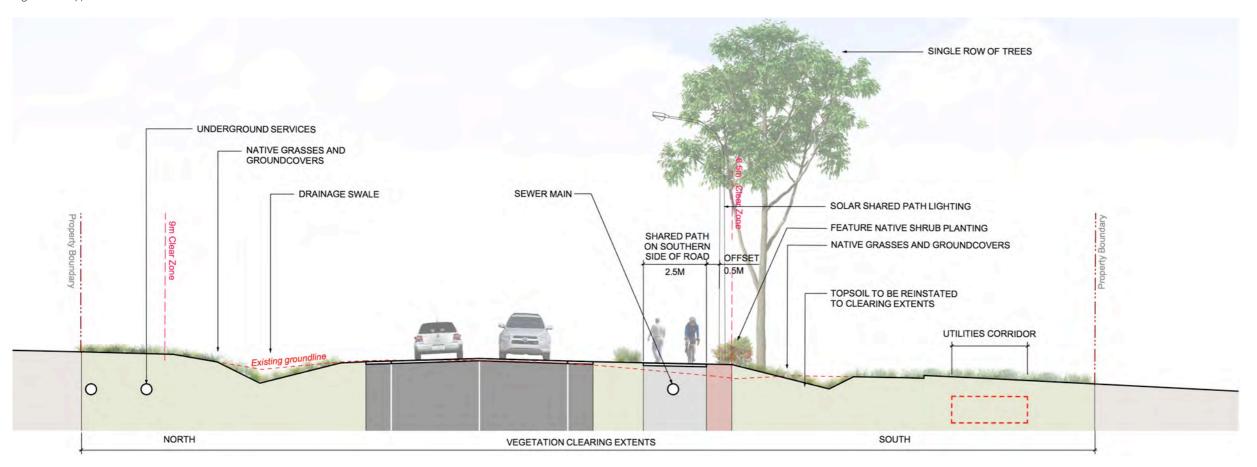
Typical cross section of Boulevard treatment in Zone 4, shown at station 8,775
